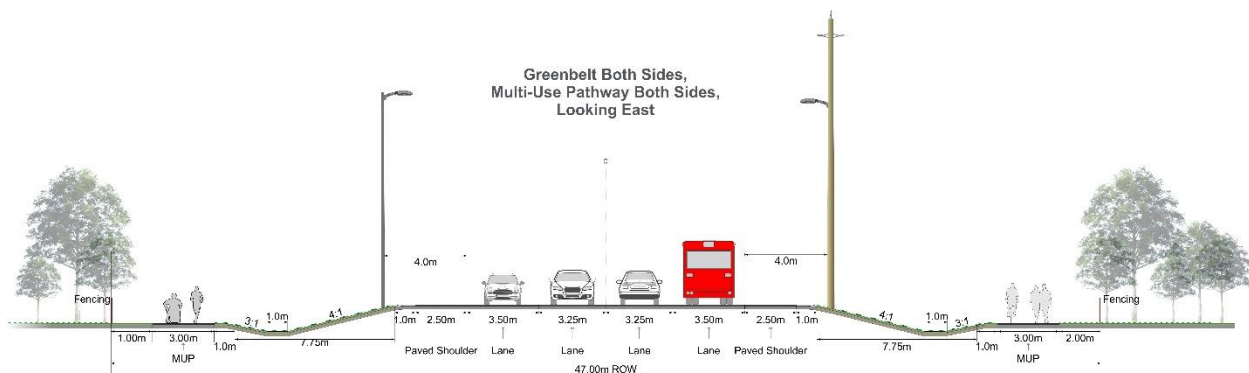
Leitrim Road – east of Airport Business Park to Albion Road
